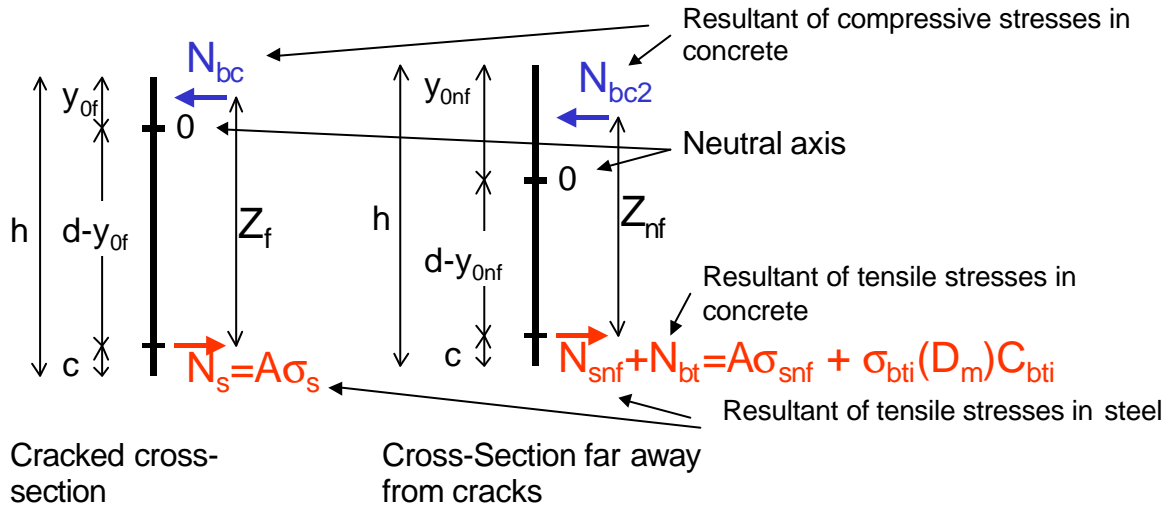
Parameters allowing internal forces to be calculated in cracked and crack-free cross-sections from [13]
